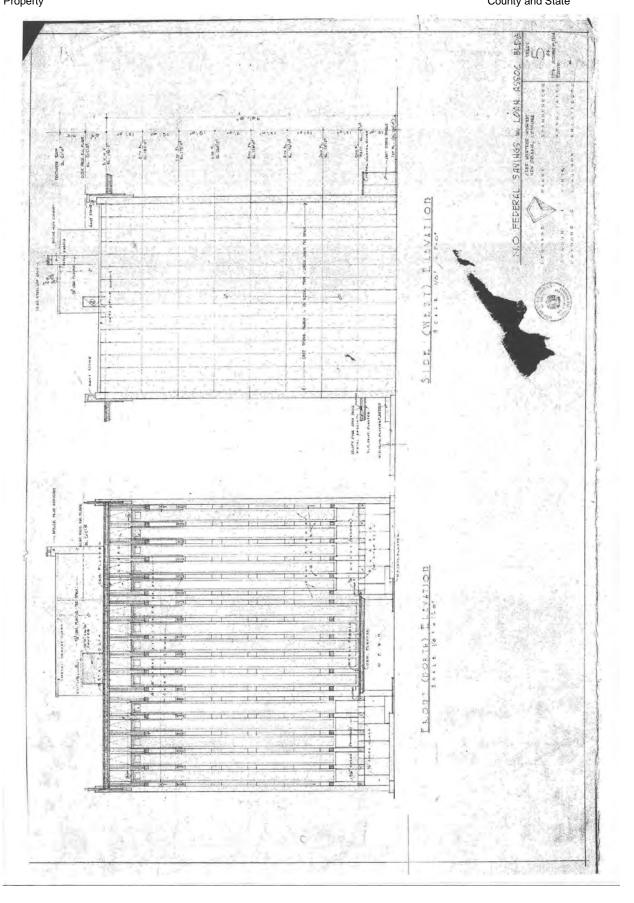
Original Plans – North and west elevations. Image courtesy of Reggie D. Winfield.
